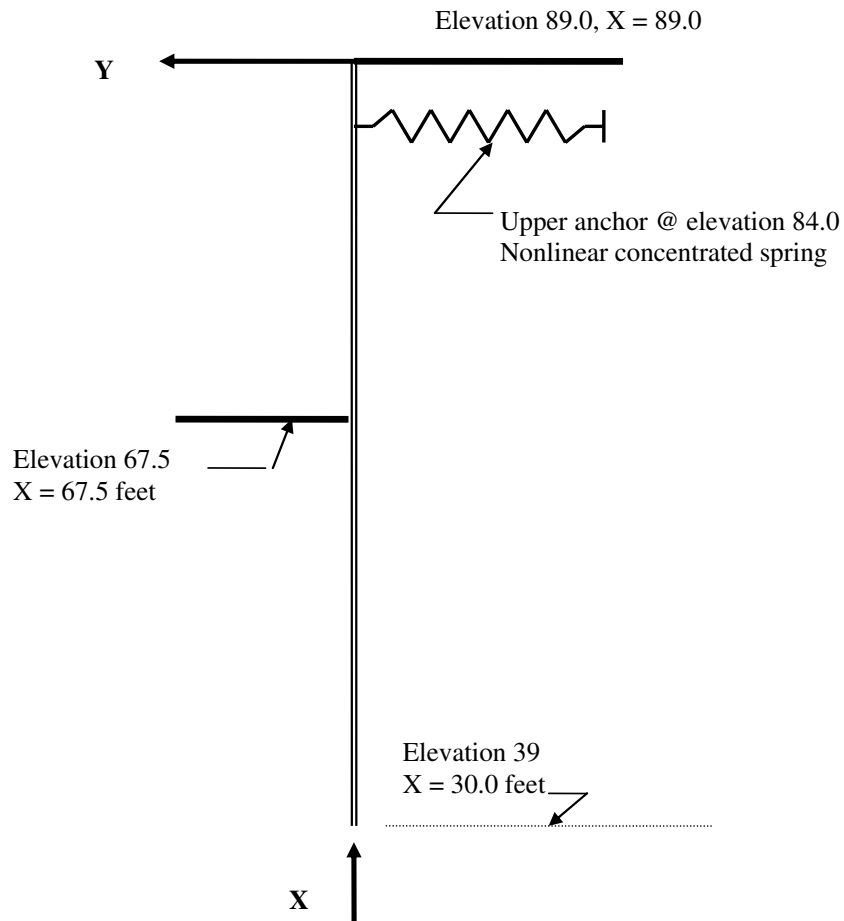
Excavate to elevation 67.5 and anchor modeled as nonlinear concentrated spring
